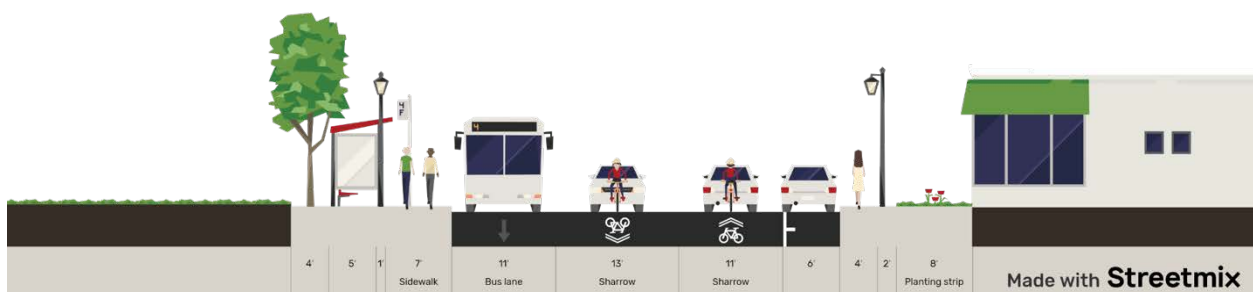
Proposed layout for Carroll Street, looking north from Winburn Street. This new design will include a cut-out for buses to pull into, and an improved bus shelter (with wayfinding information installed). Bike sharrows will be added to the road, and pedestrian scale lighting will be installed on both sides of the street. Additionally, the existing sidewalk on the park side will be widened and updated to ensure that it is fully ADA-compliant. Diagram created in Streetmix by EC, 2022.
